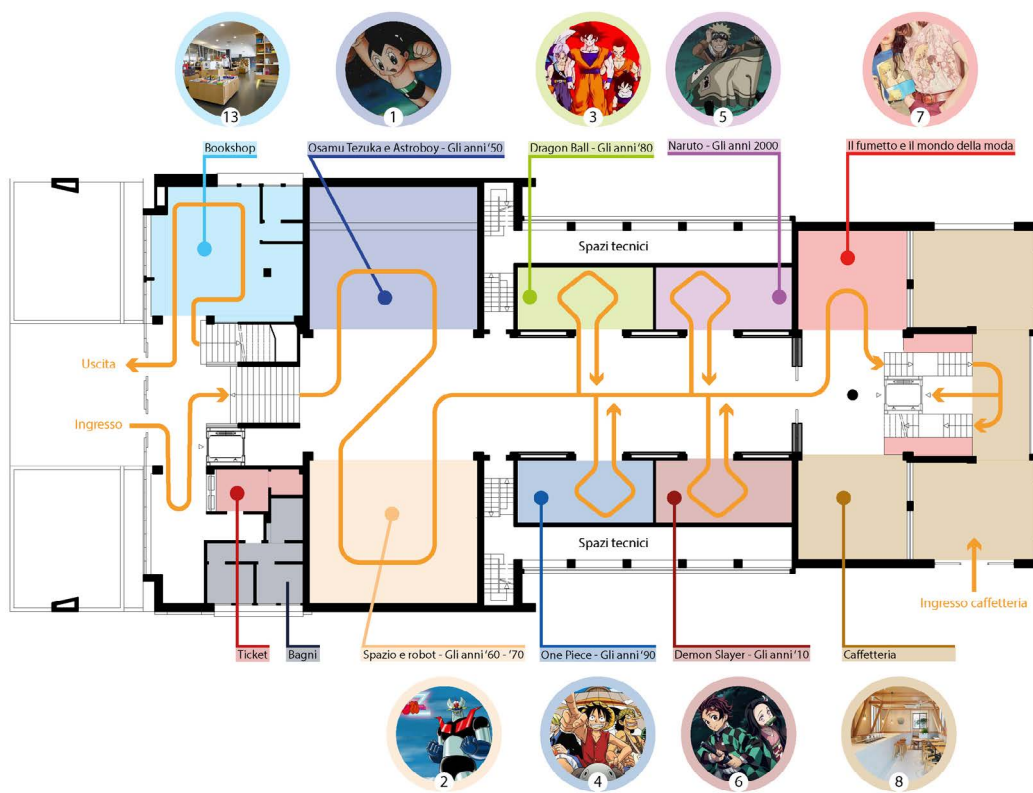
Thematic/narrative layout of the ground floor (Author: V. Bottari).
